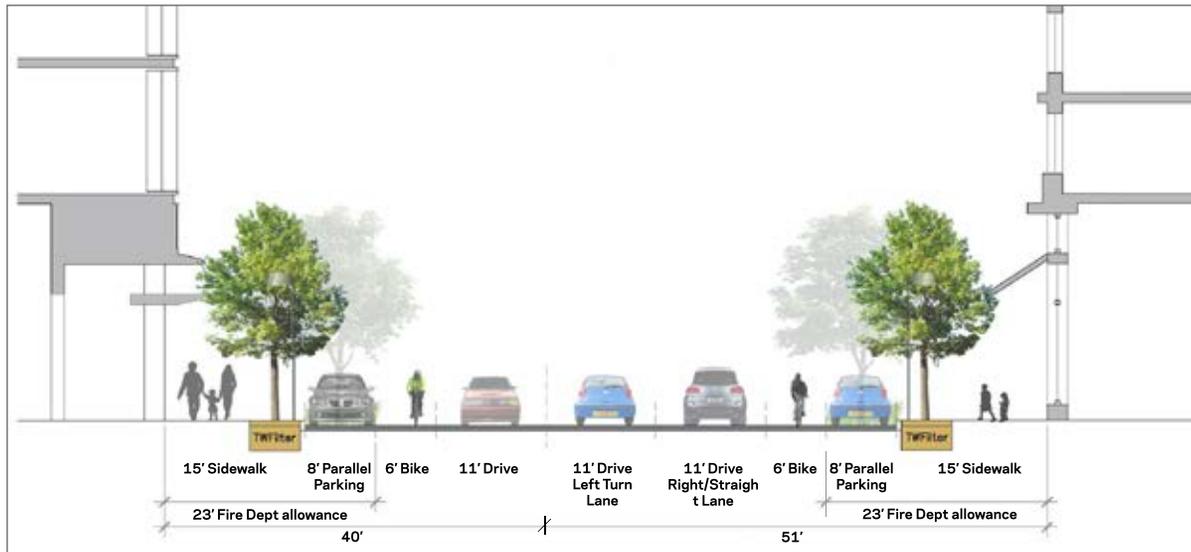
Liberty Street: Beacon Ave. to Walnut Ave.- Street Plan (top)
